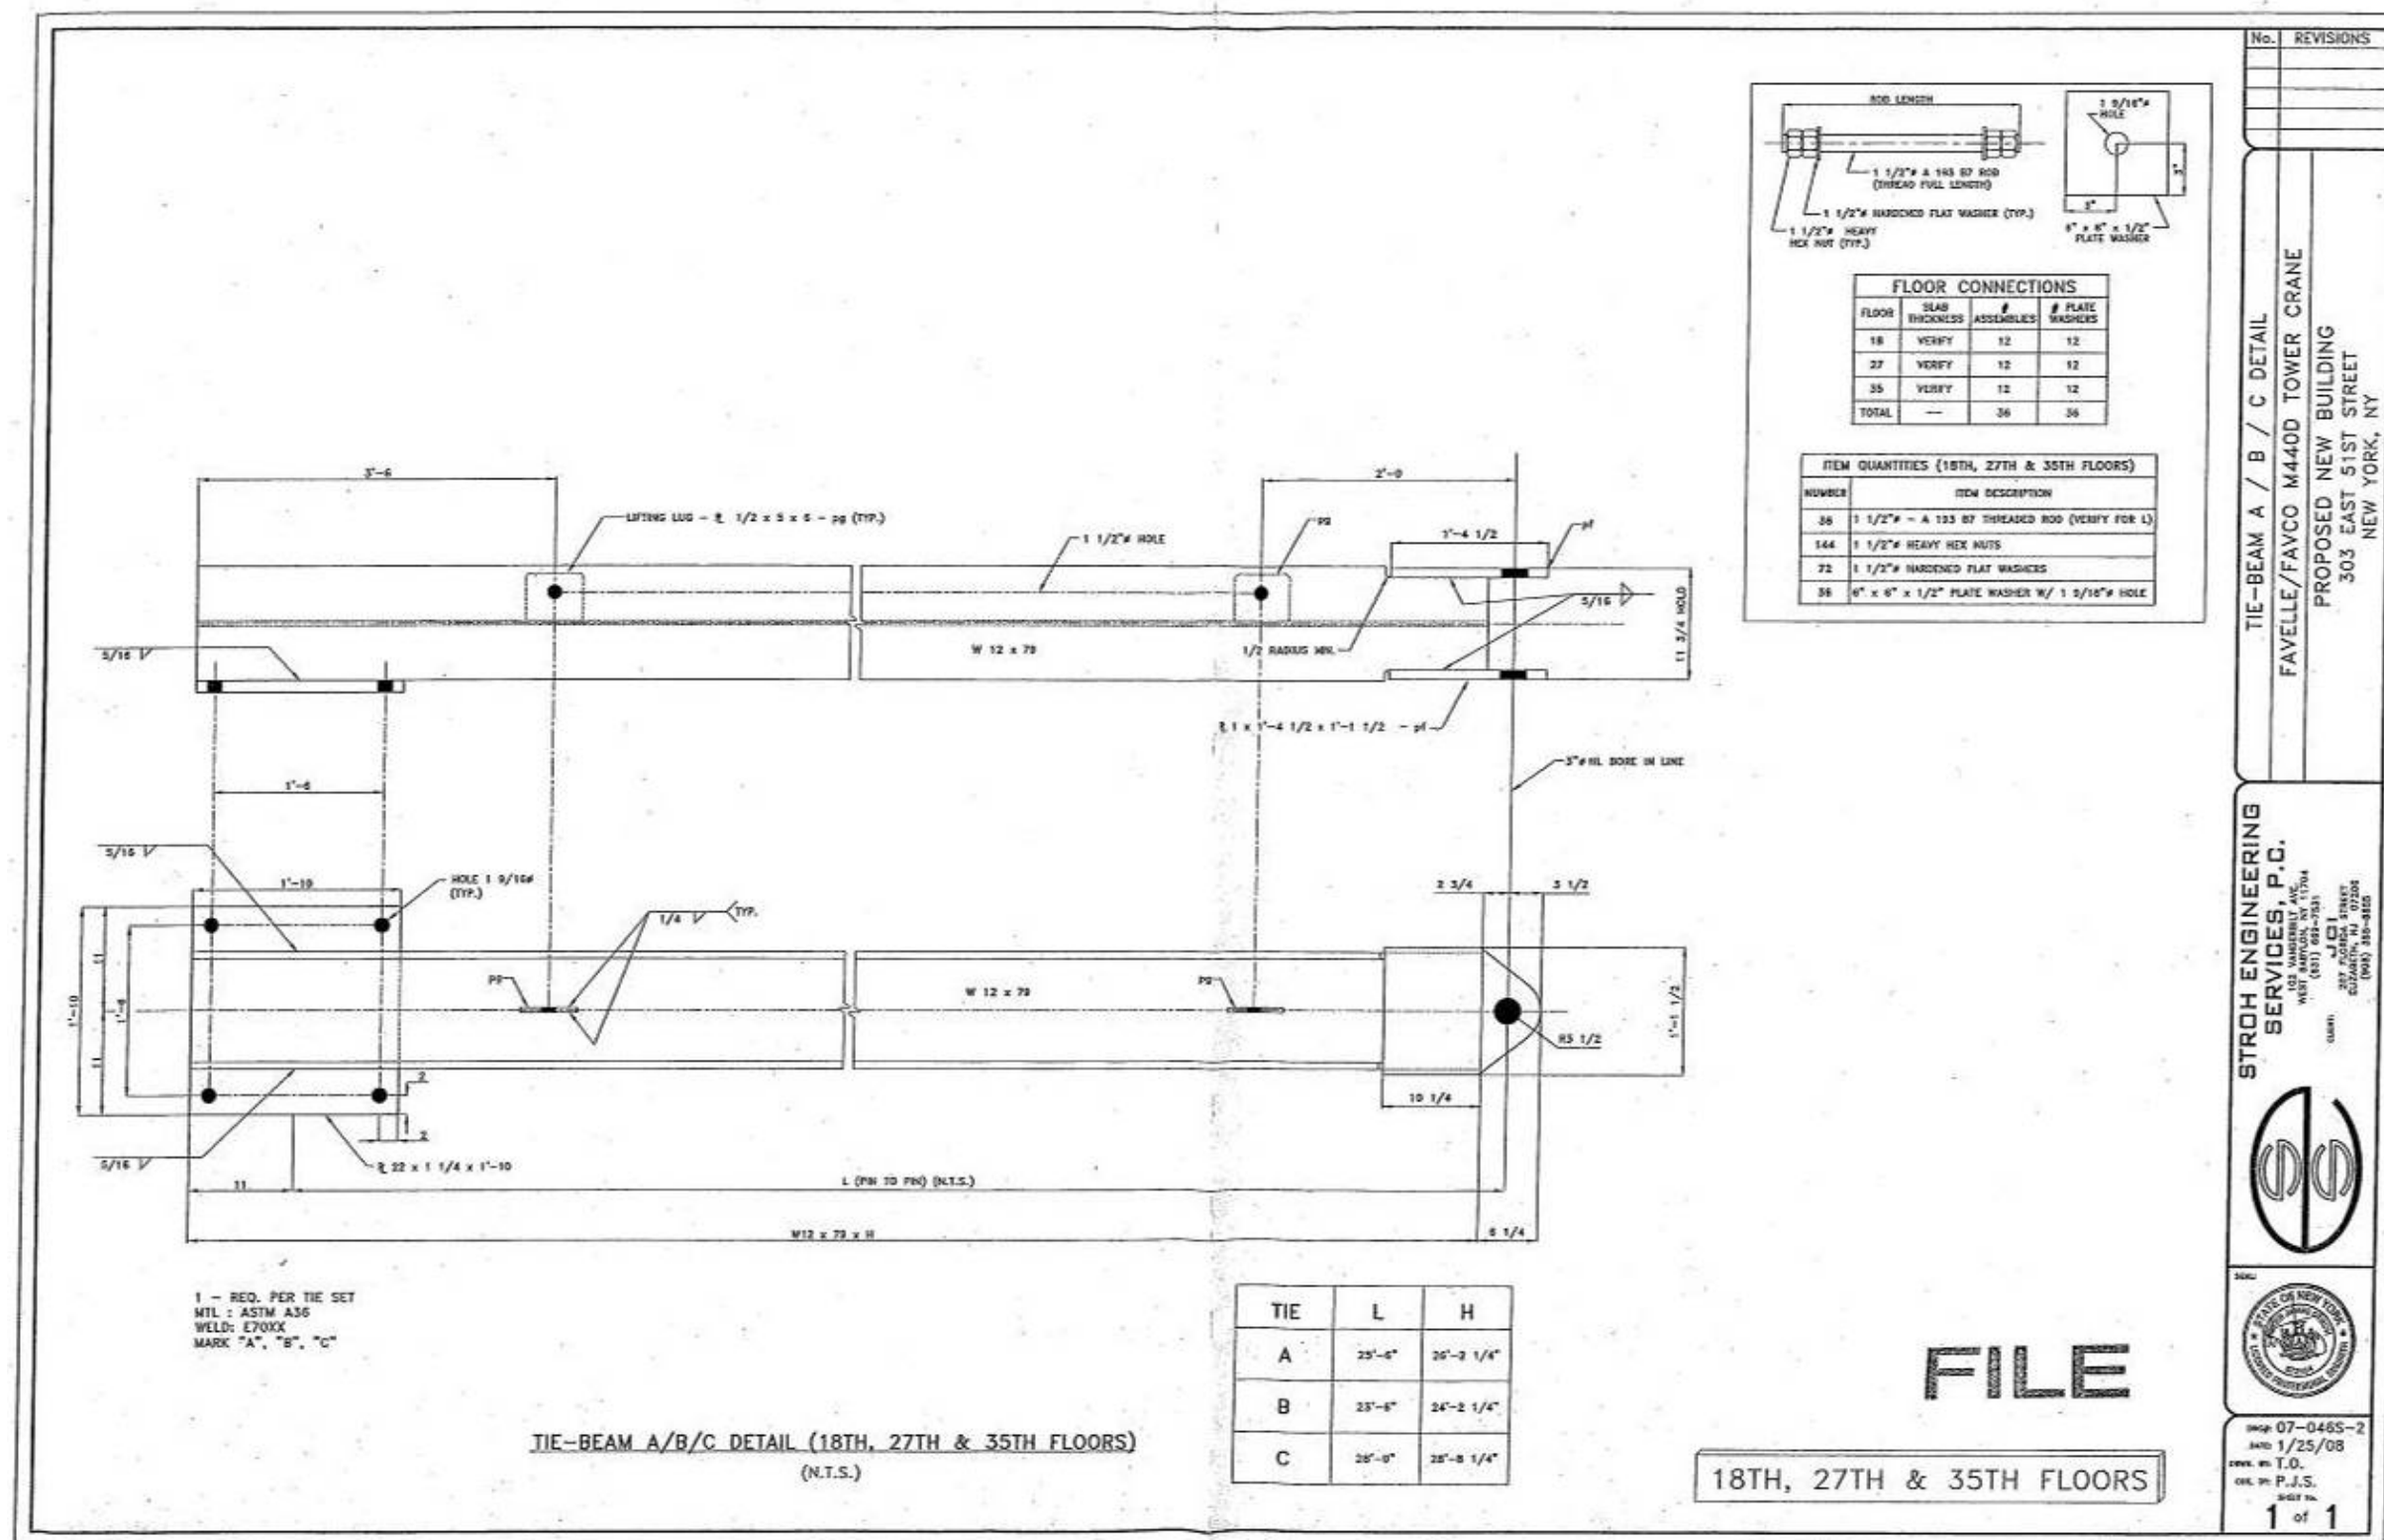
Drawing 07-046S-2, Tie-Beam A/B/C Detail, prepared by the crane engineer Stroh Engineering Services, PC
